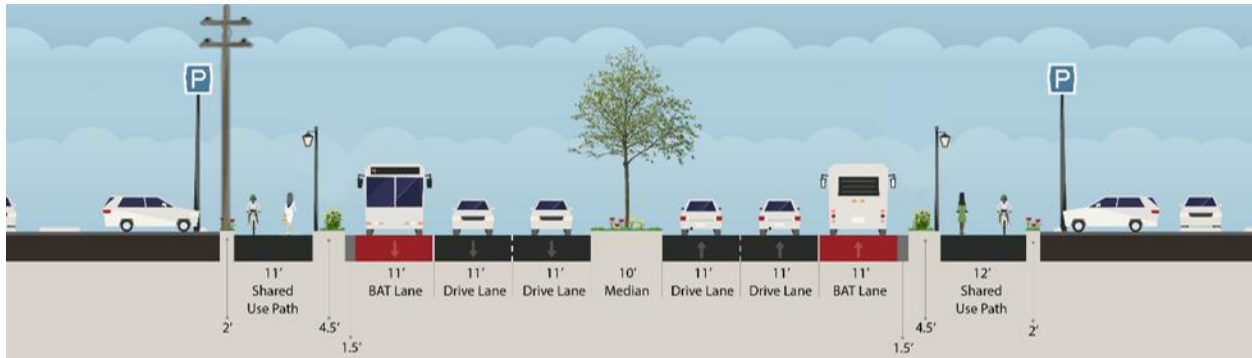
Corridor-Wide Concept 1B – 115ft Right-of-way (Long-Term) (Source: Streetmix)
